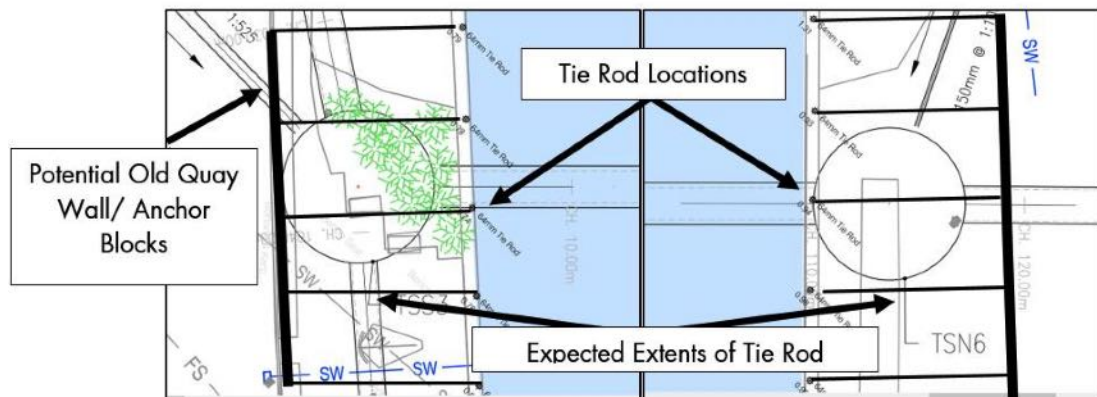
Indicative layout of existing infrastructure at the river crossing
